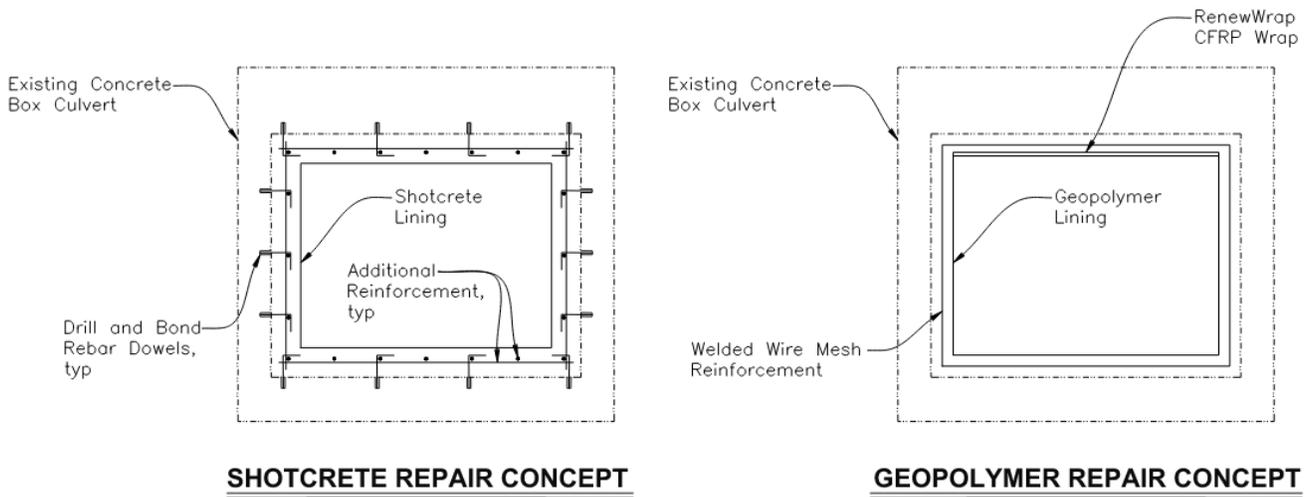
Preliminary Repair Concepts for Box Culvert Section
